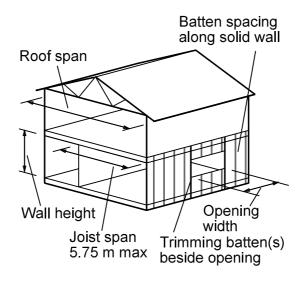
External Wall Battening – Lower of Two Storey or Subfloor – with internal support wall
